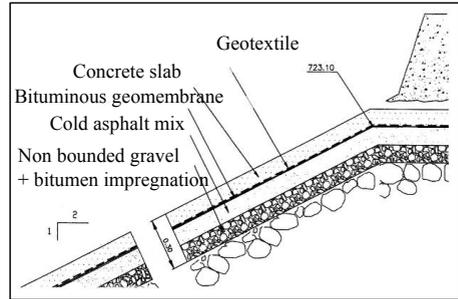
Typical cross section at La Galaube Dam (after Gautier, 2003).
